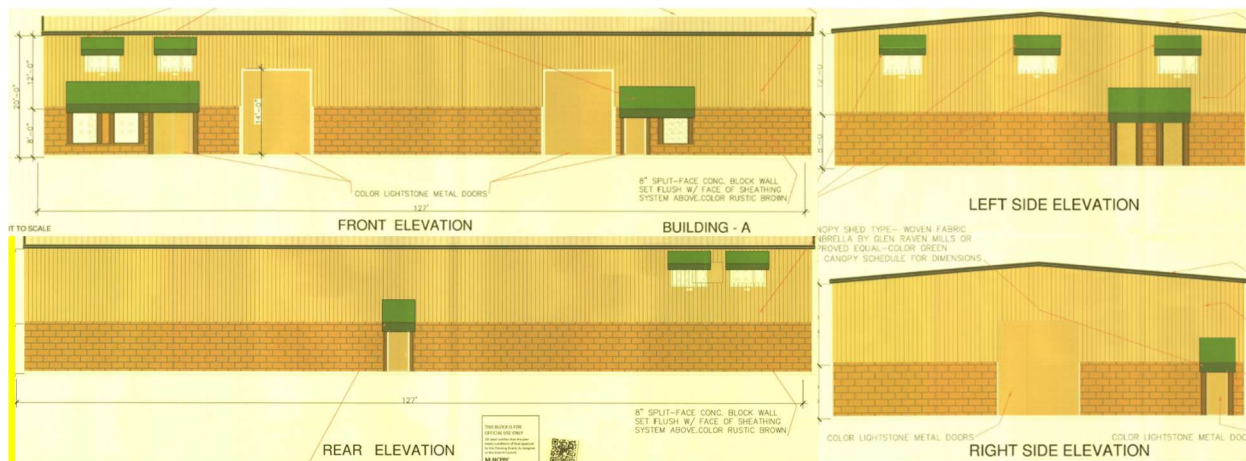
Proposed Architectural Elevations for Building A. Similar architecture is proposed for Buildings B and C.
